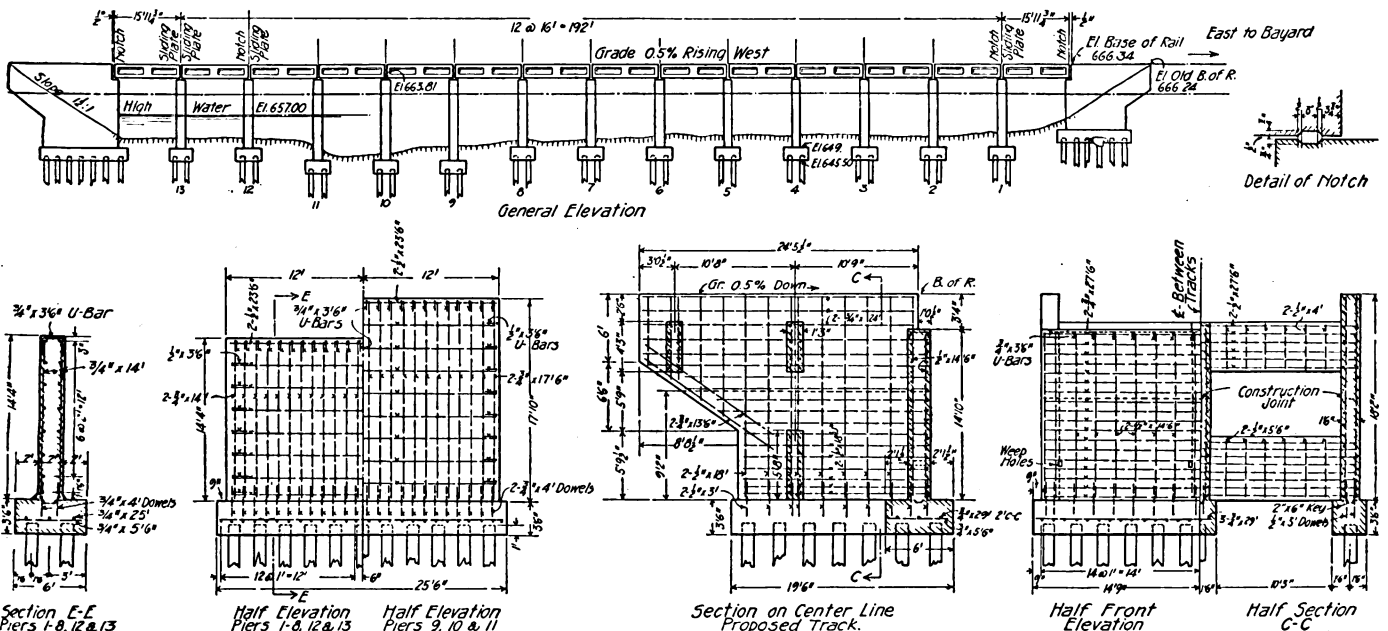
Reinforced Concrete Double-Track Trestle, Fourteen 16-Foot Spans, 2 1/4 Miles West of Bayard, Ia., C., M. & St. P. Ry.
